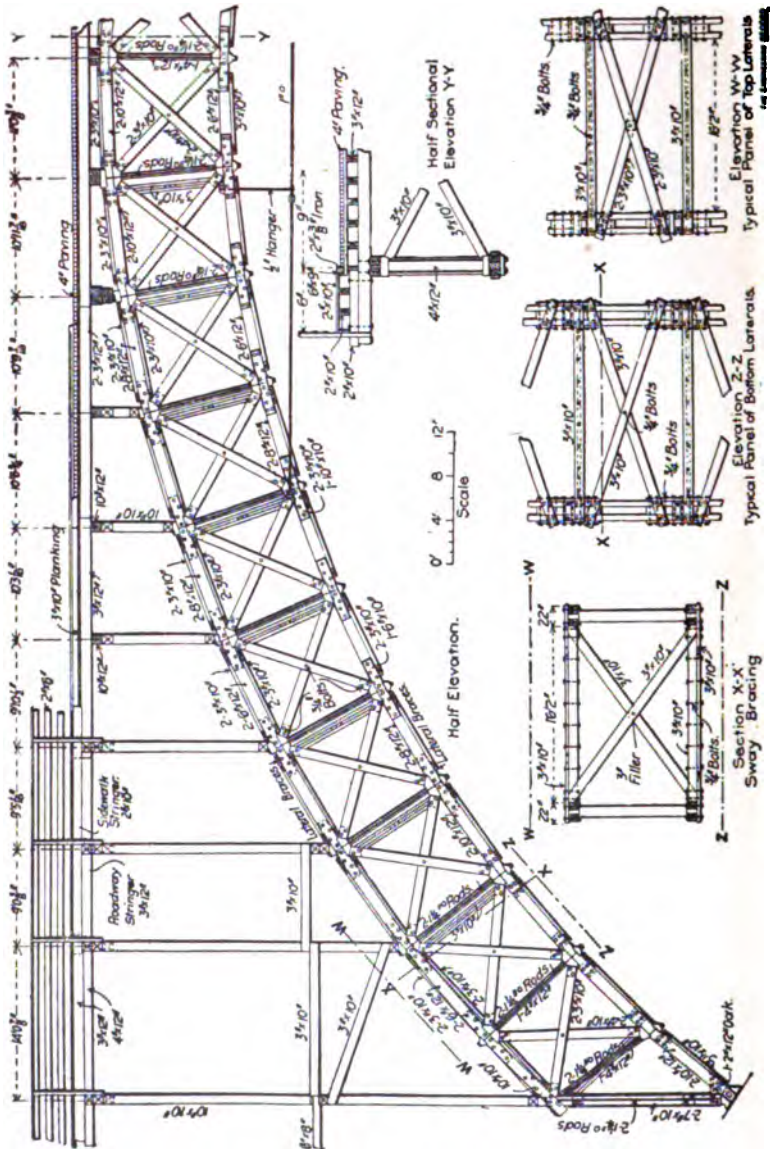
Wooden Trussed Arch Bridge over Mendota Ravine, near St. Paul, Minn.
